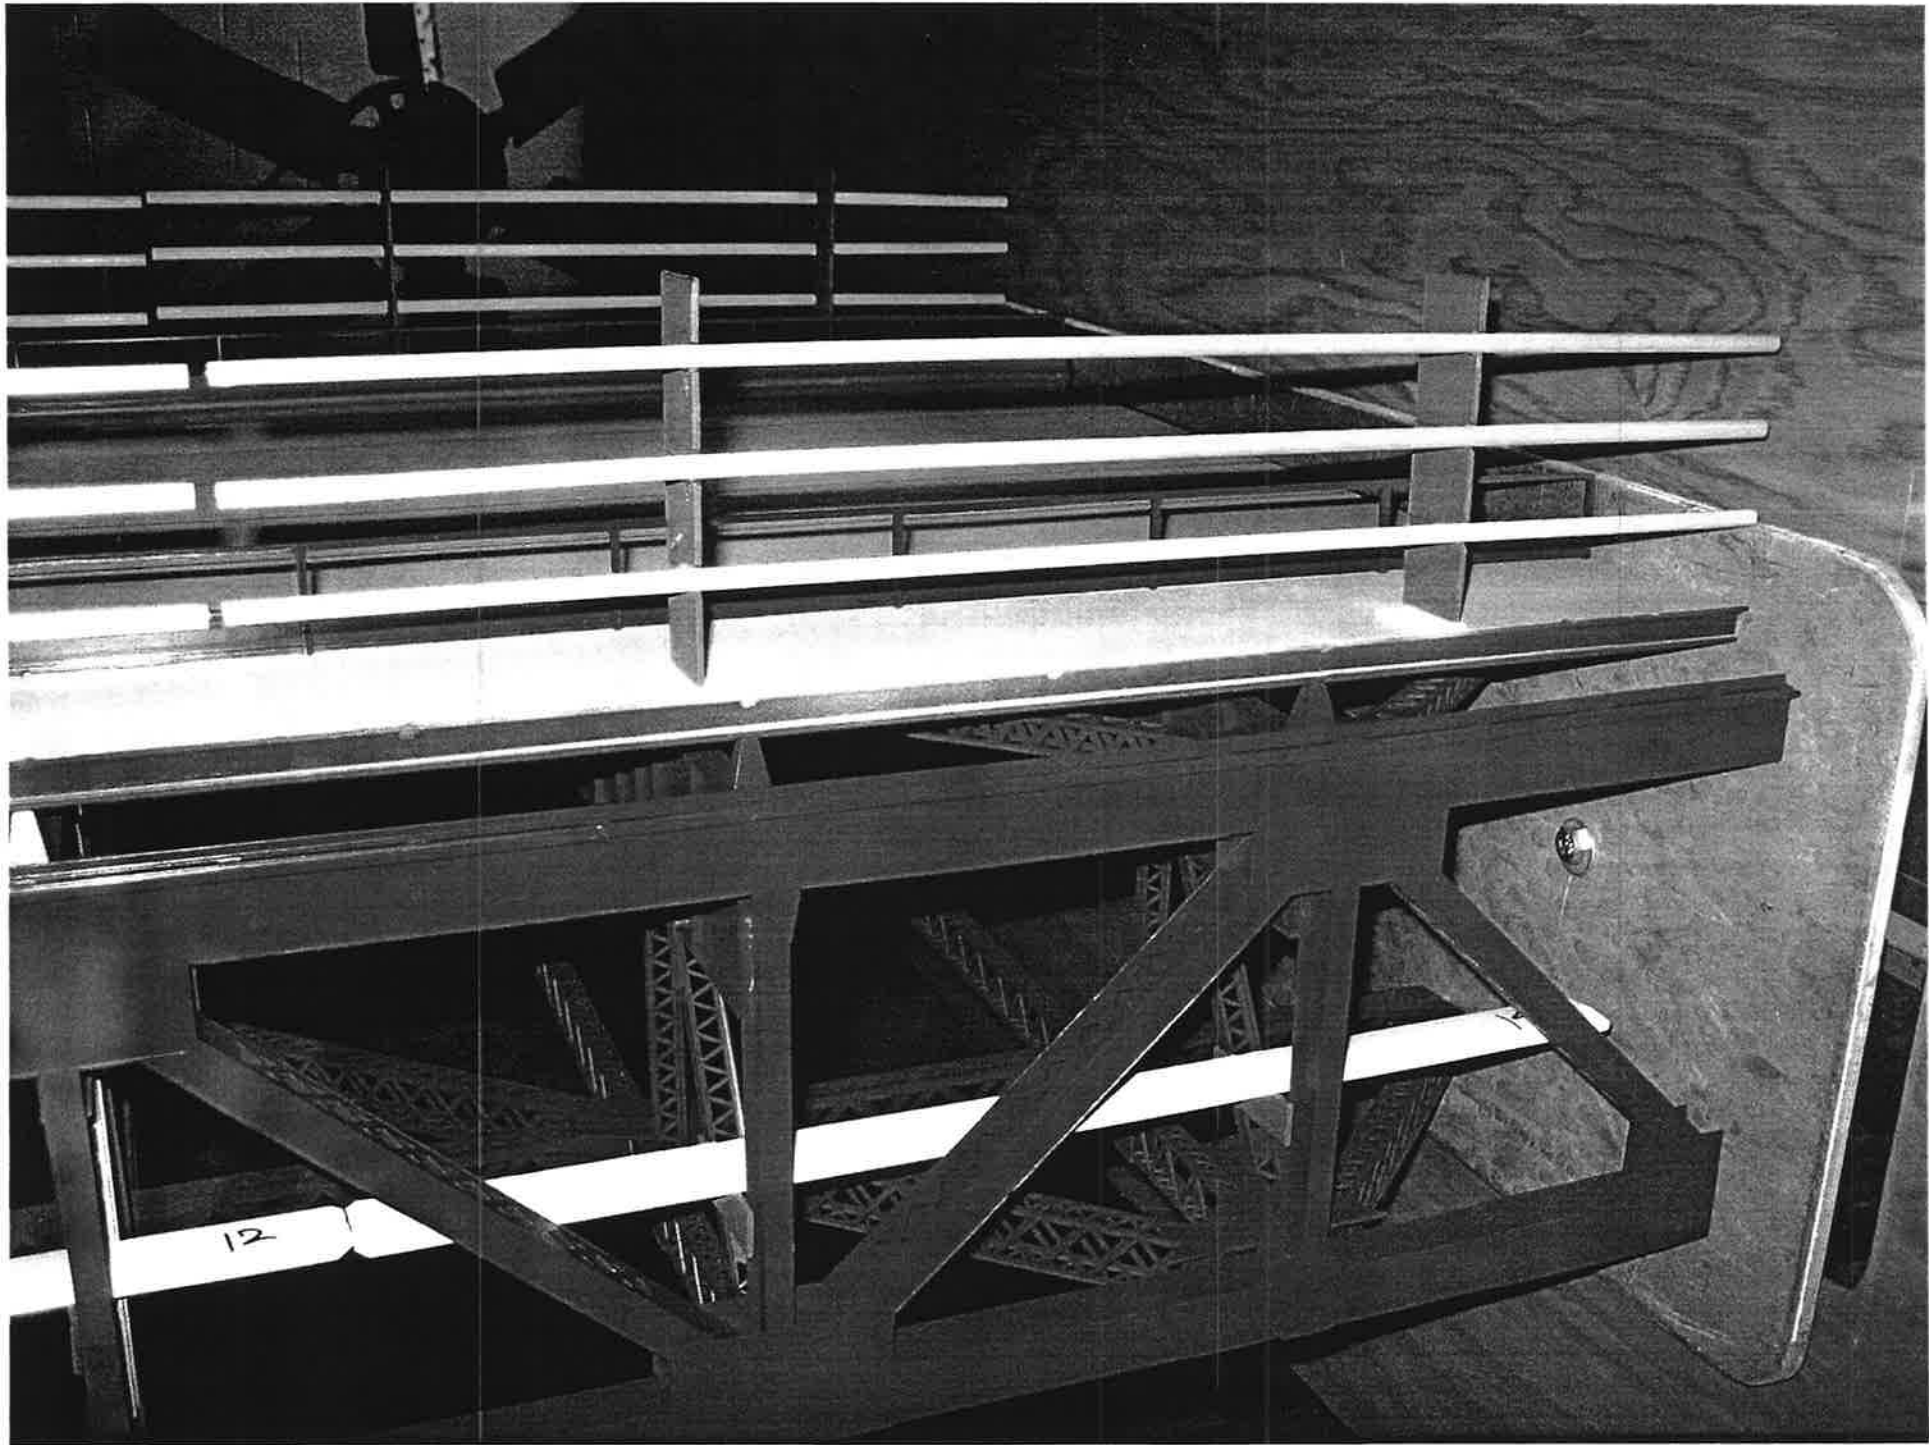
CONCEPT 2 : REPLACING THE EXISTING RAILING; WINGLETS UNDER DECK
